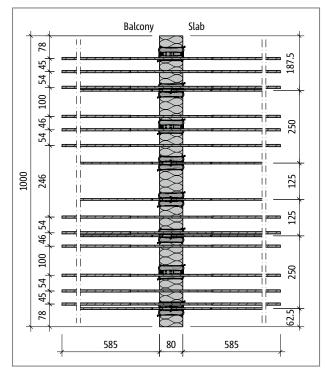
Schöck Isokorb® T type K-M4-V1: Product layout
